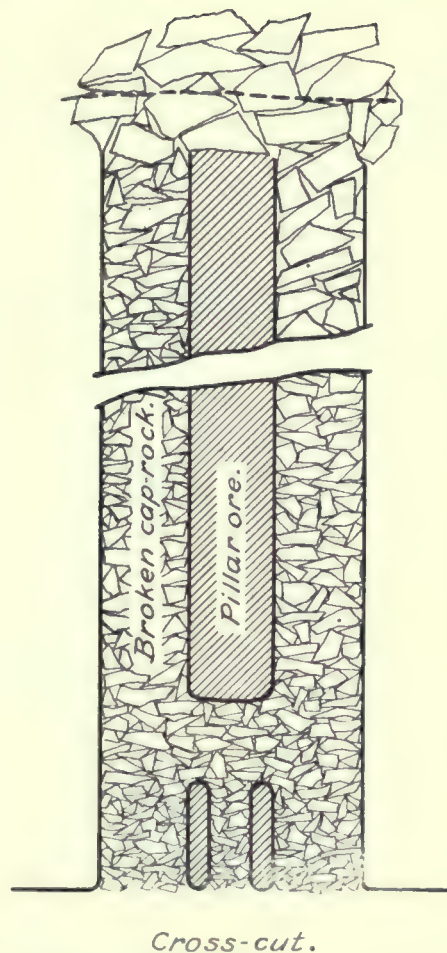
CROSS-SECTION OF STOPES AND PILLAR AFTER DRAWING.
